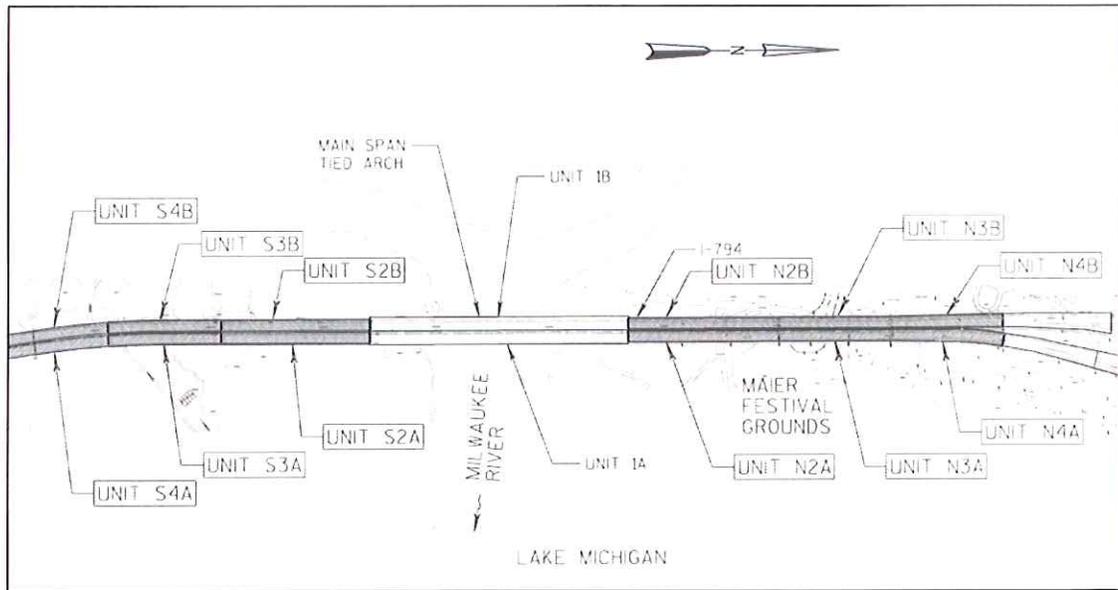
Plate girder/floor beam/stringer approach span units location plan
